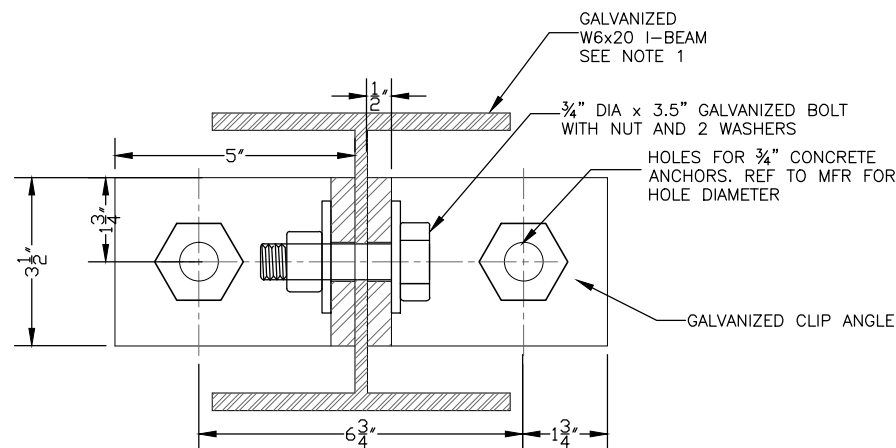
I-BEAM STIFFENER PLATE (PLAN VIEW)
